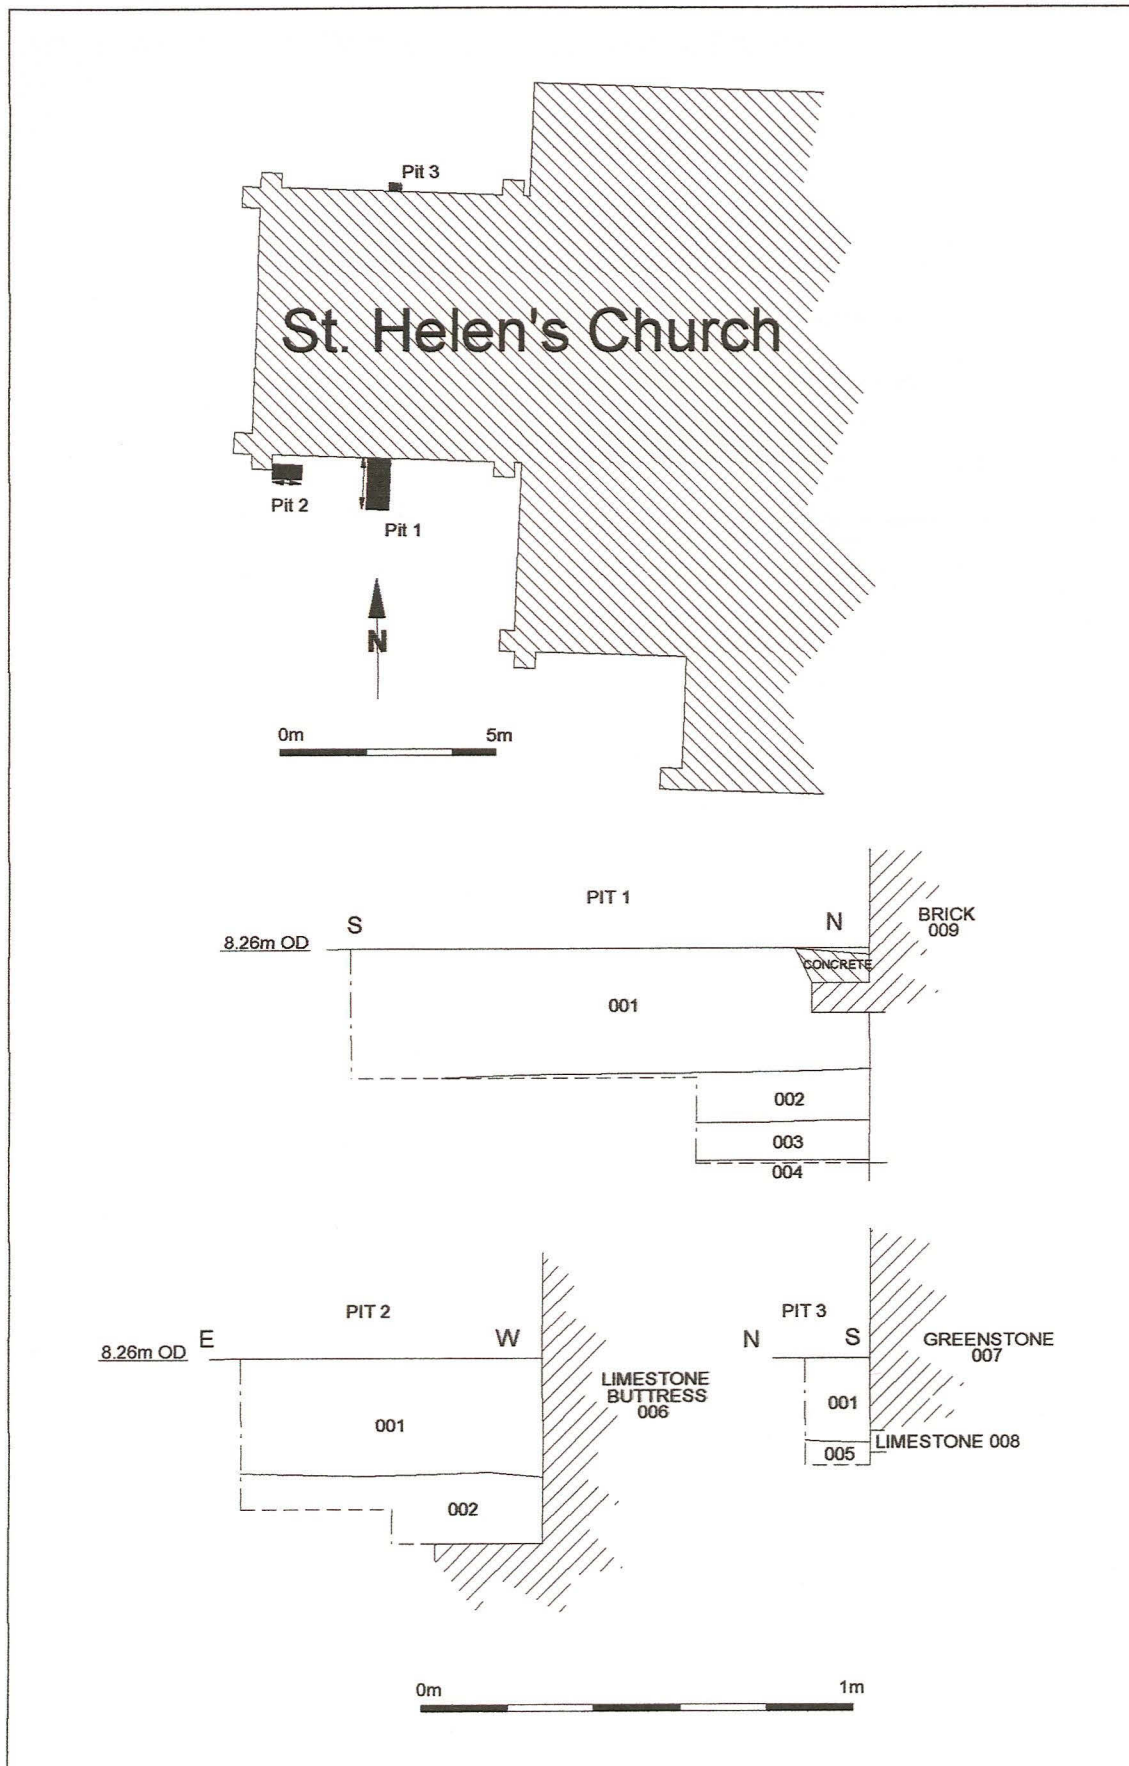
Plan showing location of Trial Pits & Sections 1 – 3 (not to scale).
